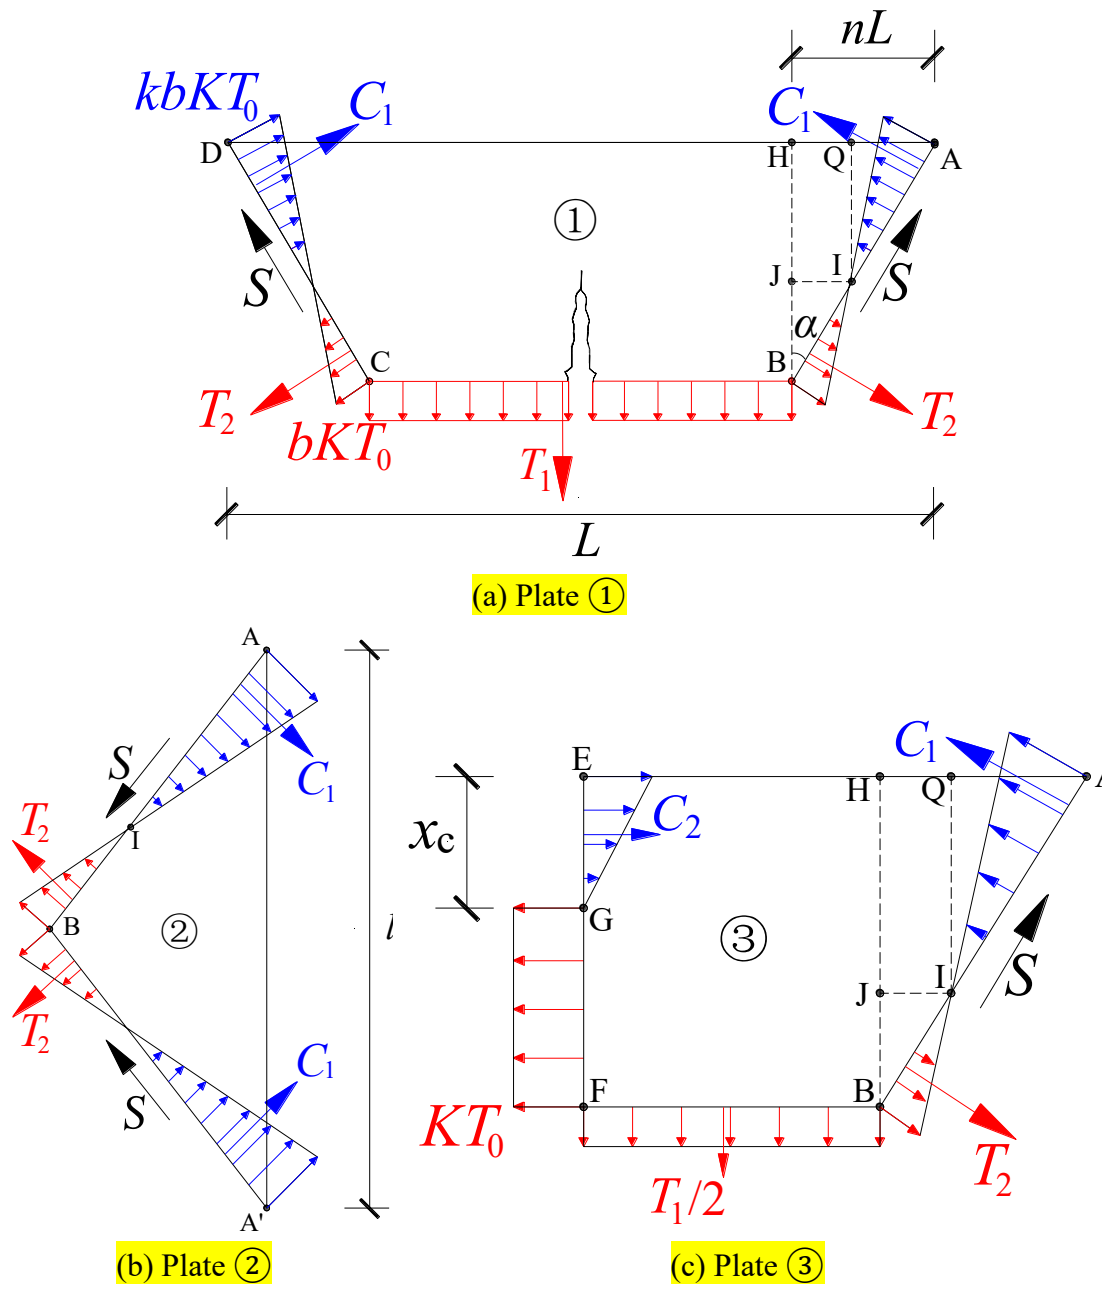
Failure modes, plates and internal forces distribution in the concrete slab
